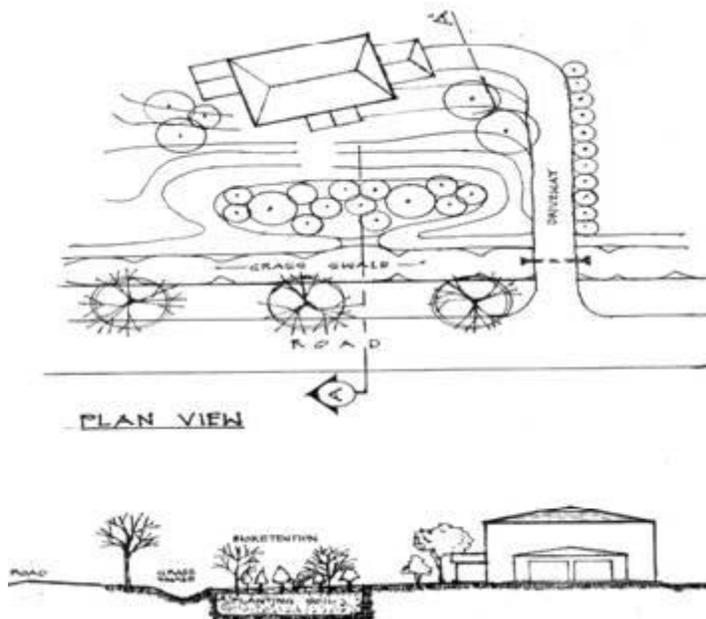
Plan view and cross section of a swaleside bioretention area
